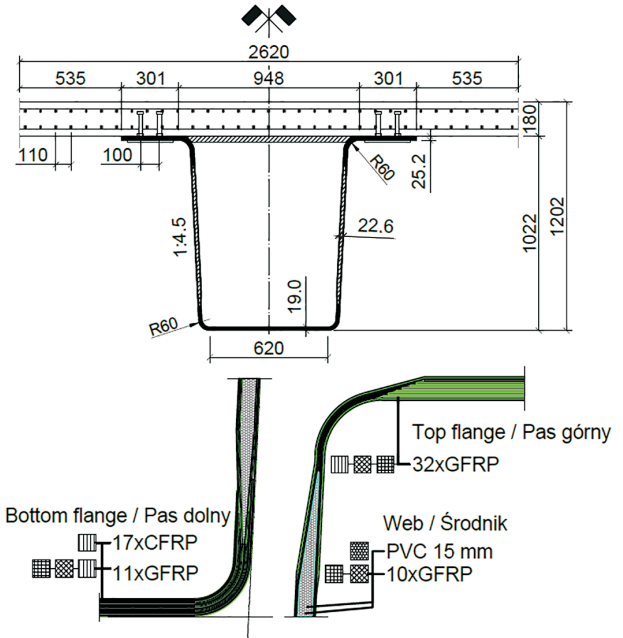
Hybrid FRP/concrete girder cross-section [mm]
